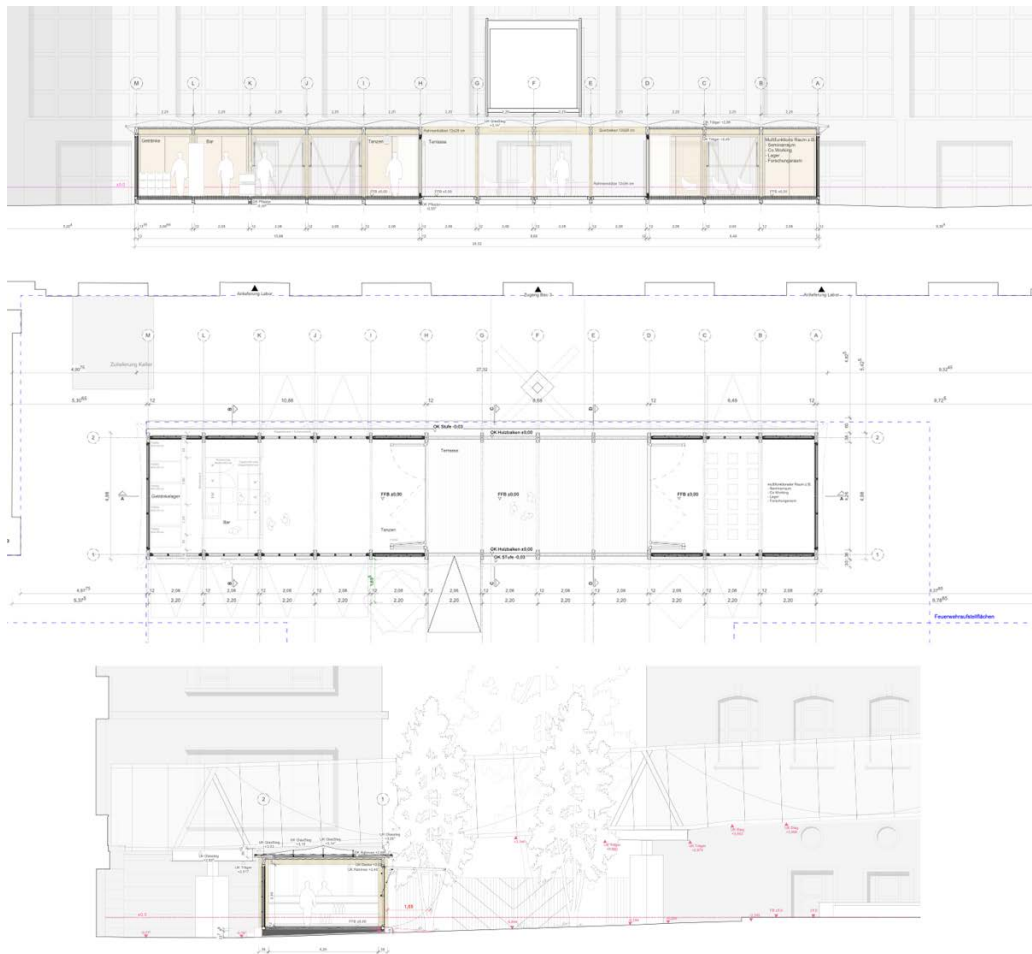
Design drawings: longitudinal section, floor plan, cross-section and structural concept (red), source: HFT Stuttgart
